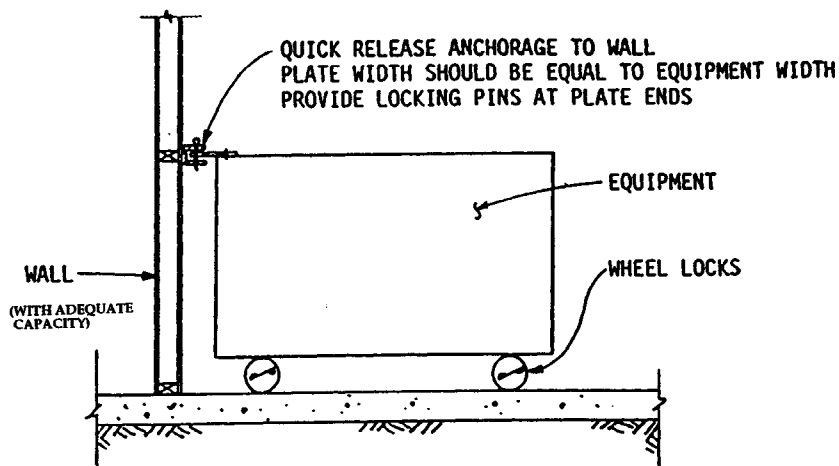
Approaches for Anchoring Machine Shop Equipment
